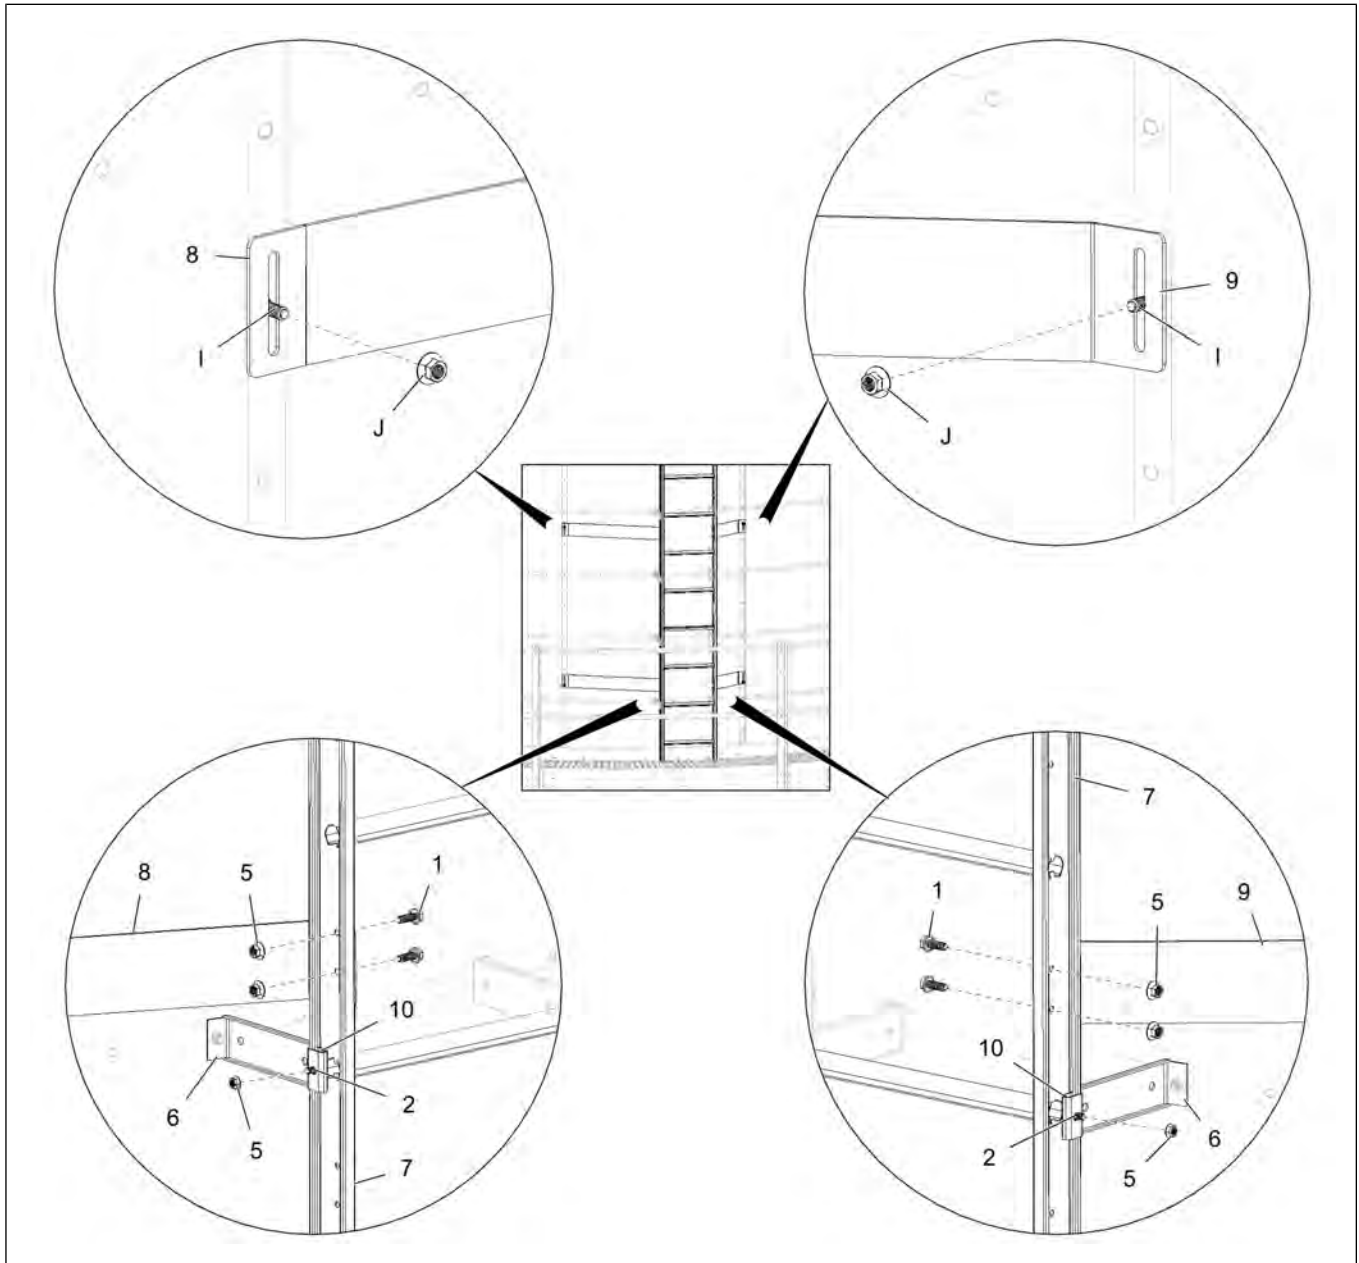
Installing the ladder stand-off and ladder brace brackets at eave platform
